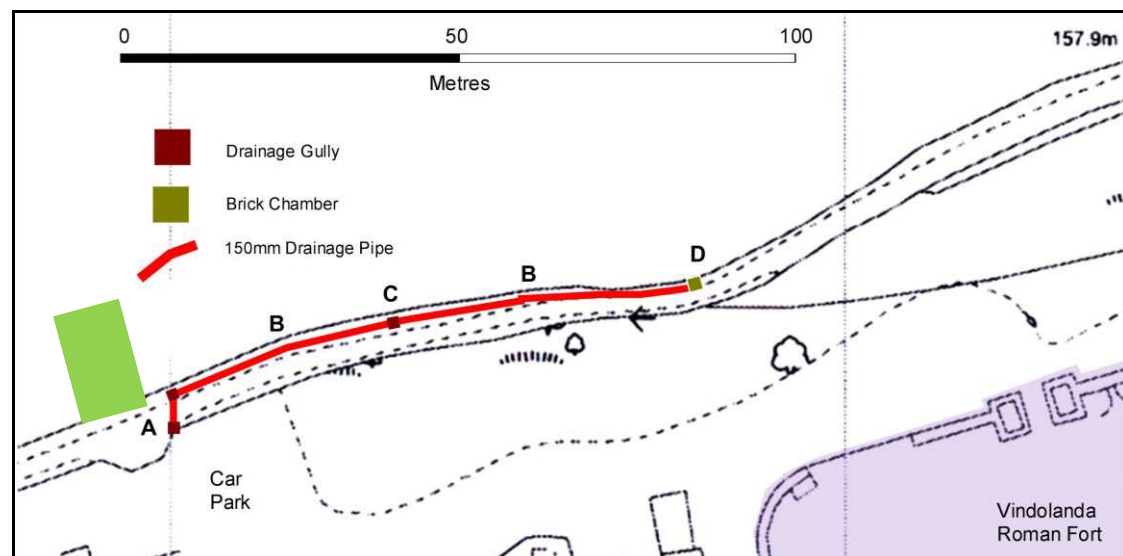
Proposed drainage works along the Stanegate at Vindolanda. For key to letters see section 3, above. The green rectangle locates the Roman building excavated in 2009 by the Vindolanda Trust (see figure 4).
